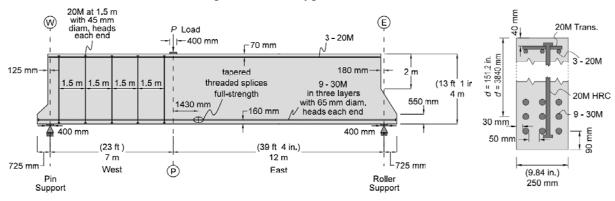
Elevation (on the left) and cross-section (on the right) of the Toronto beam
